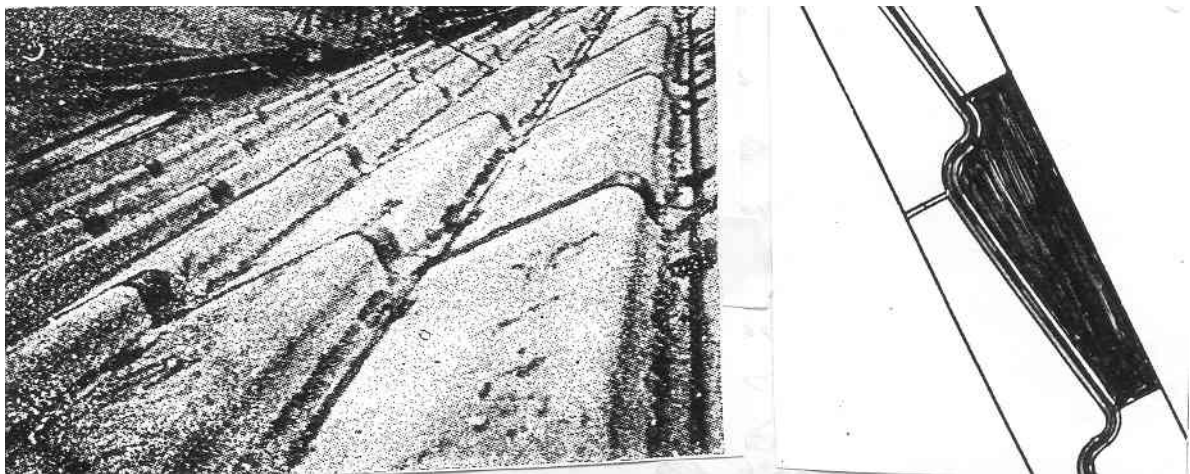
Dobsina dam – view of PVC foil sealing during construction and scheme of the sealing – precast units+PVC foil
